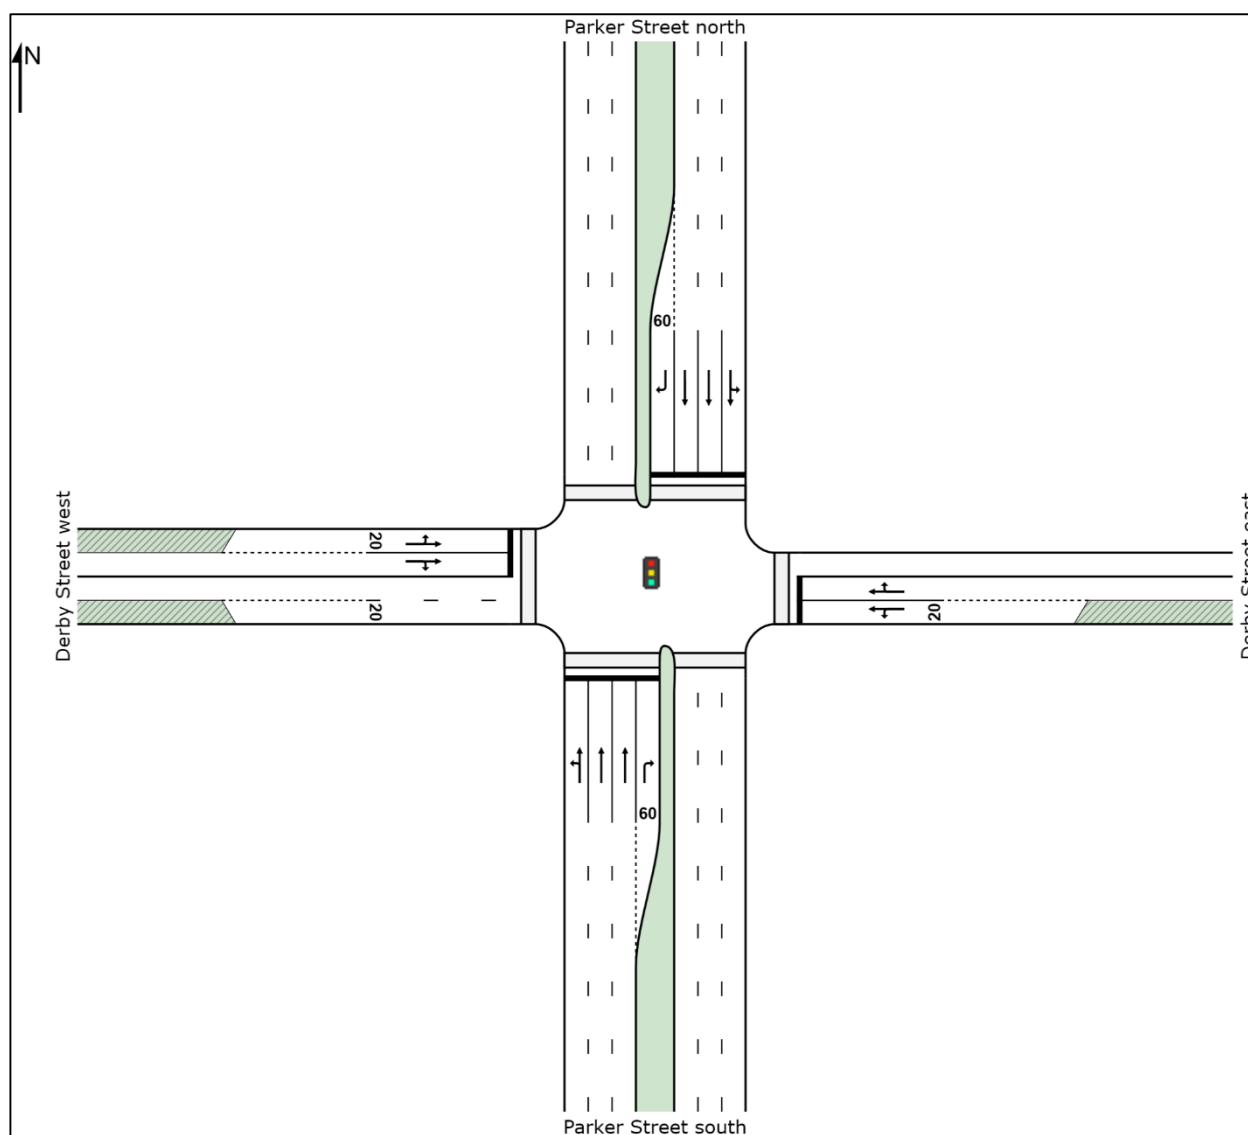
Signalised Intersection Layout of Parker Street with Derby Street (SIDRA)
